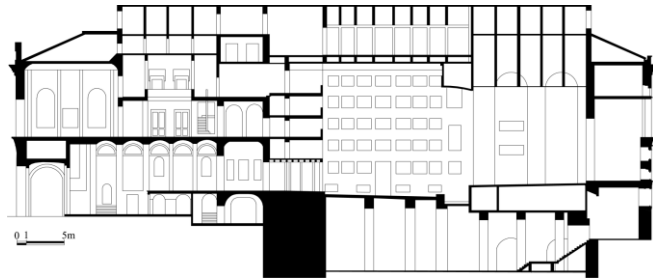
Longitudinal section of the Verdi theatre of Salerno.
